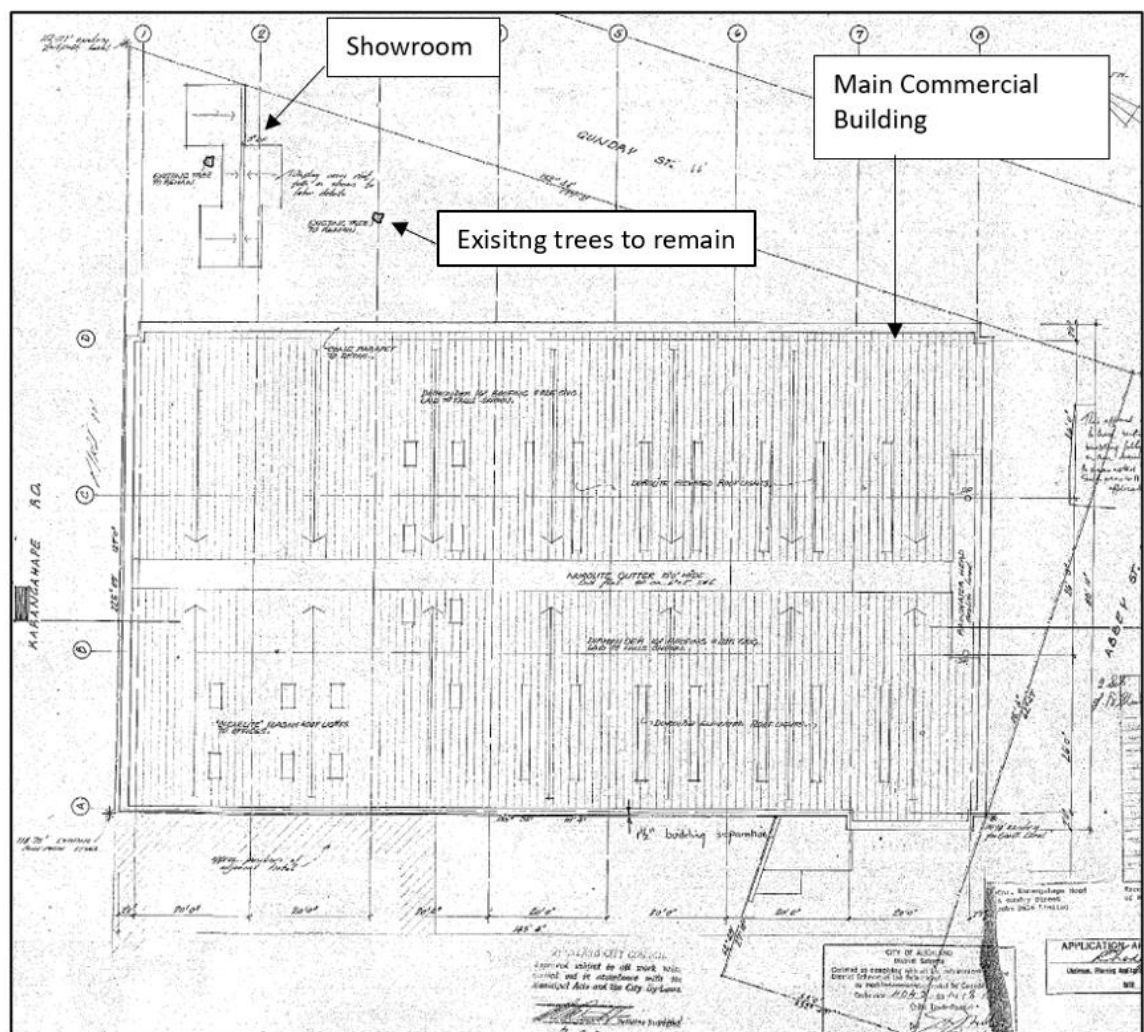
Building Plan for the Commercial Building and Showroom dated 1972 with a notation that the existing trees were to remain (source: James Kirkpatrick Group Ltd)
